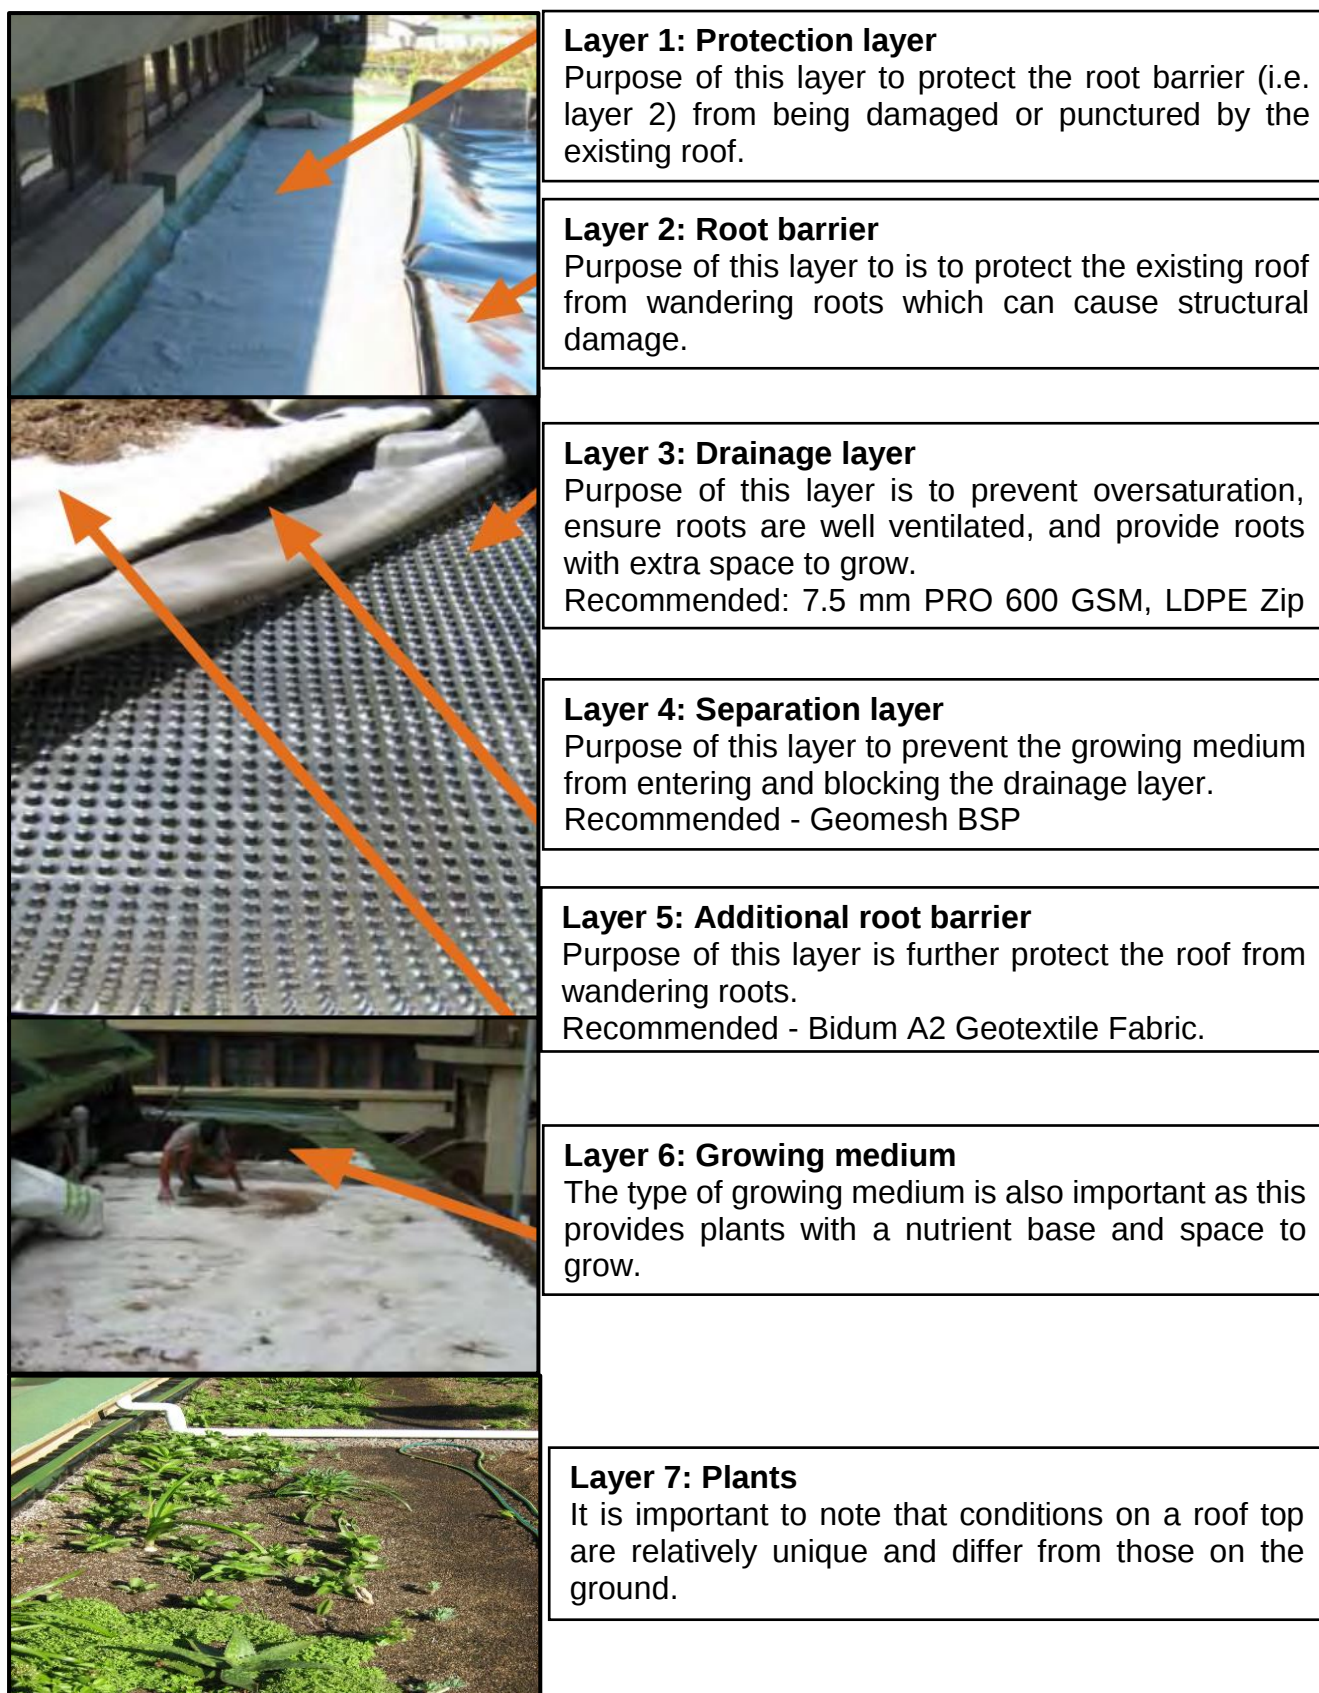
13: Construction of the in-situ green roofs at the Green Roof Pilot Project
